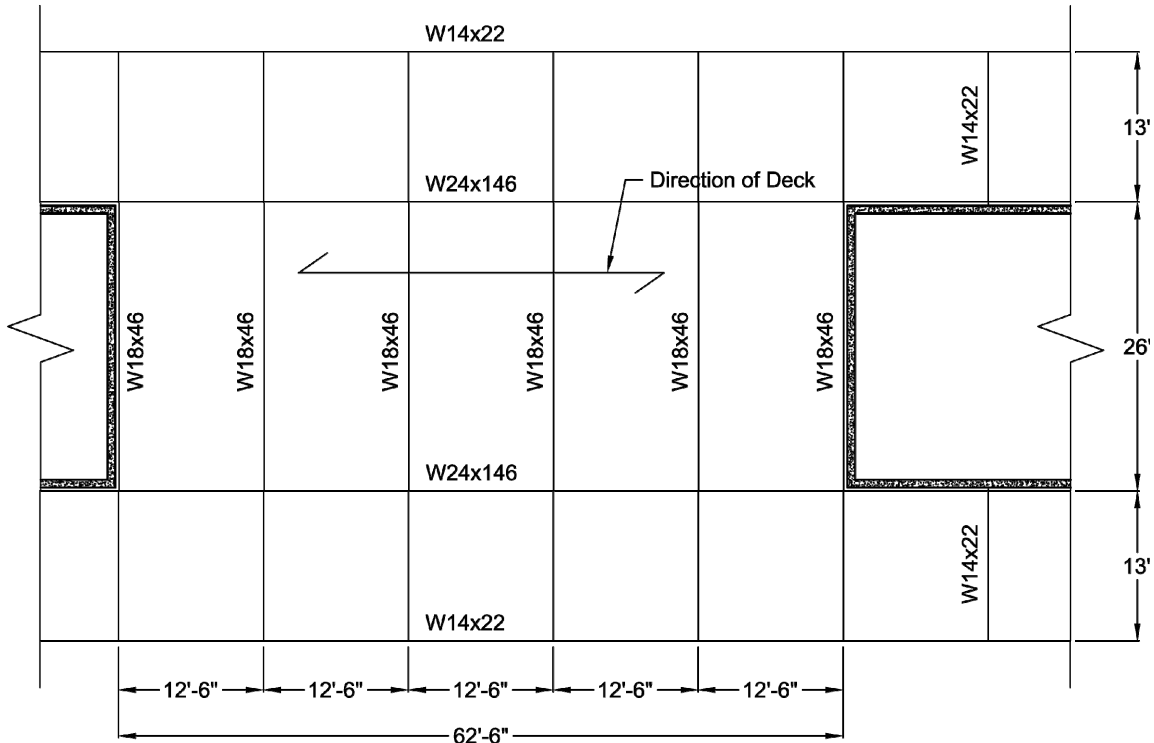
Non-composite (form) deck design framing layout for the chosen typical bay
